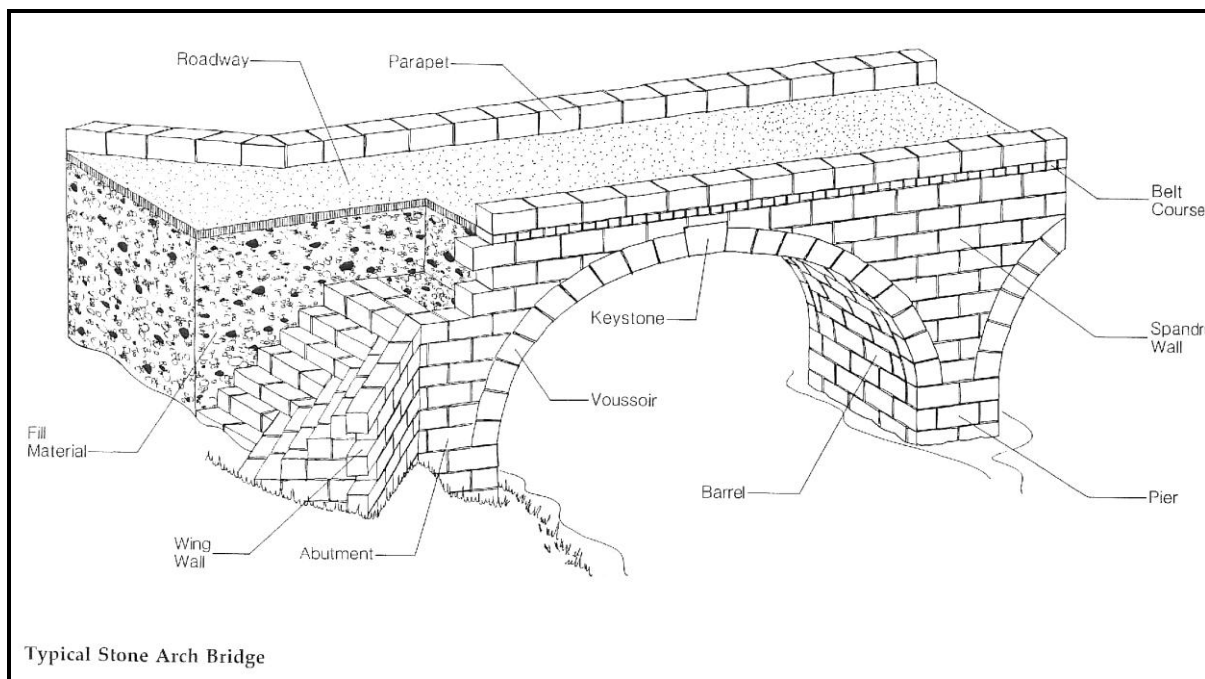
Typical Example of the Construction Methods of a Stone Arch Bridge
